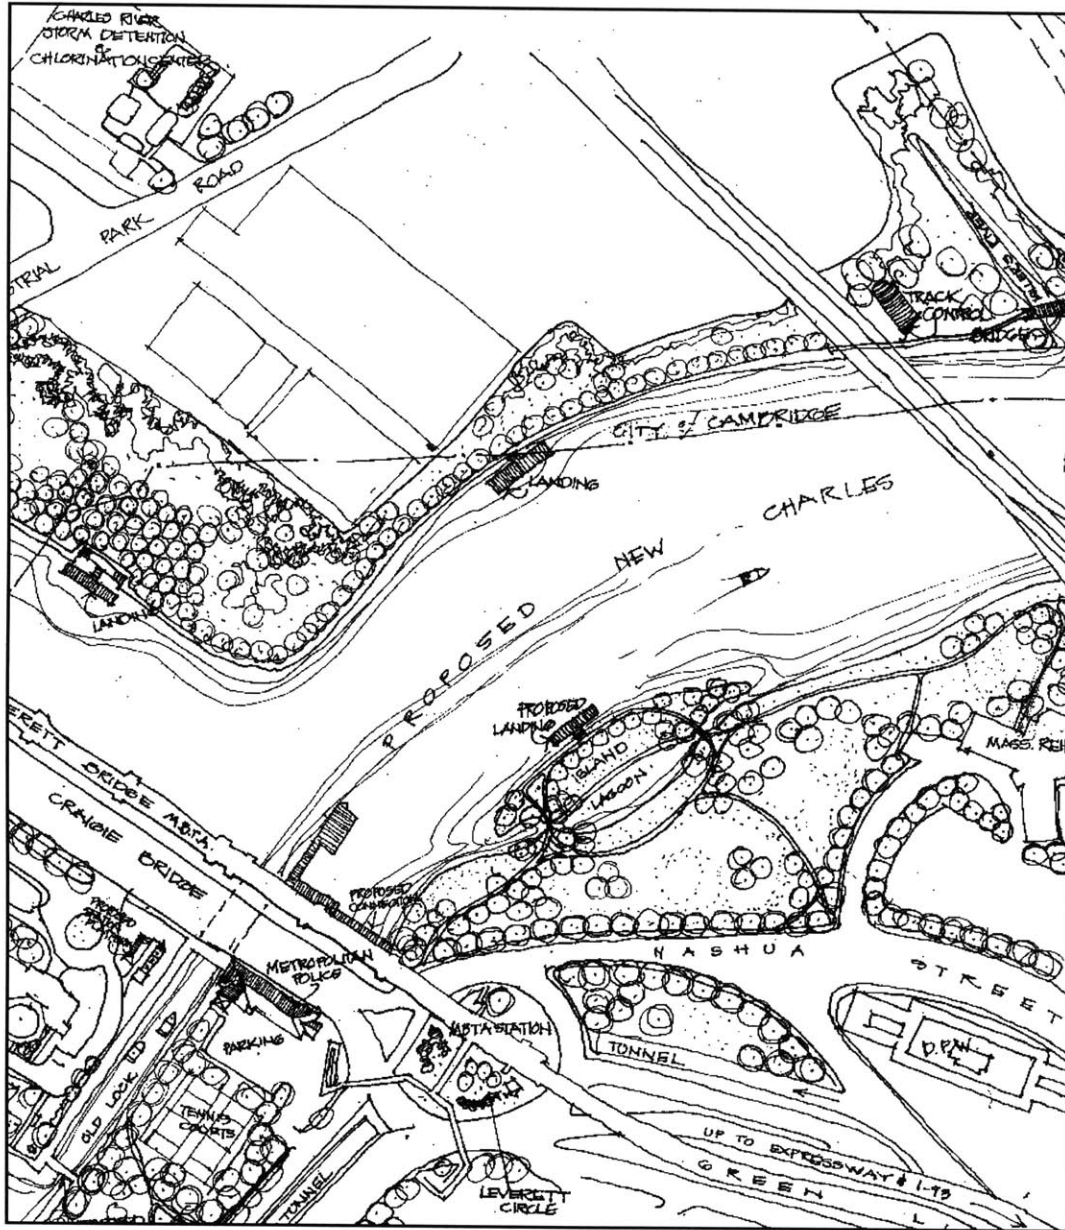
New Charles River Basin Master Plan, detail of Nashua Street and North Point, 1980.
